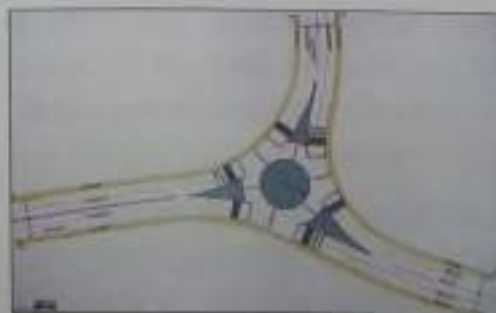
Three legged intersection conceptual drawing to be adopted for all three legged intersection
